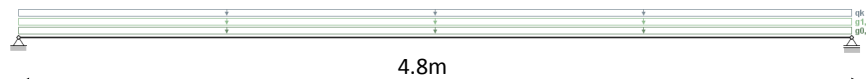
Single span beam with a width of 1m (CLTdesigner)
